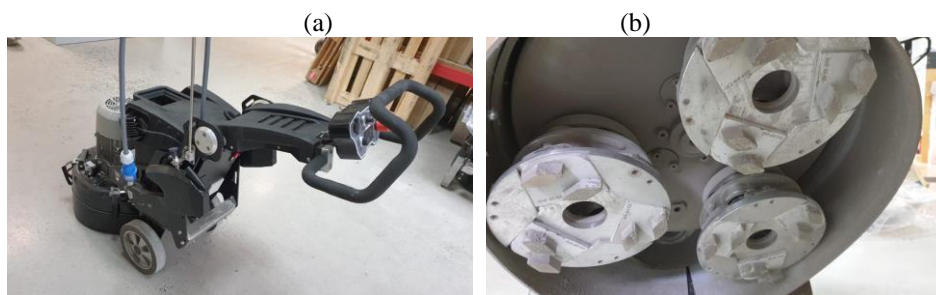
Concrete floor grinding tool set (Example 1): a) grinding machine: b) machine planetario with visible metal segments [38]
